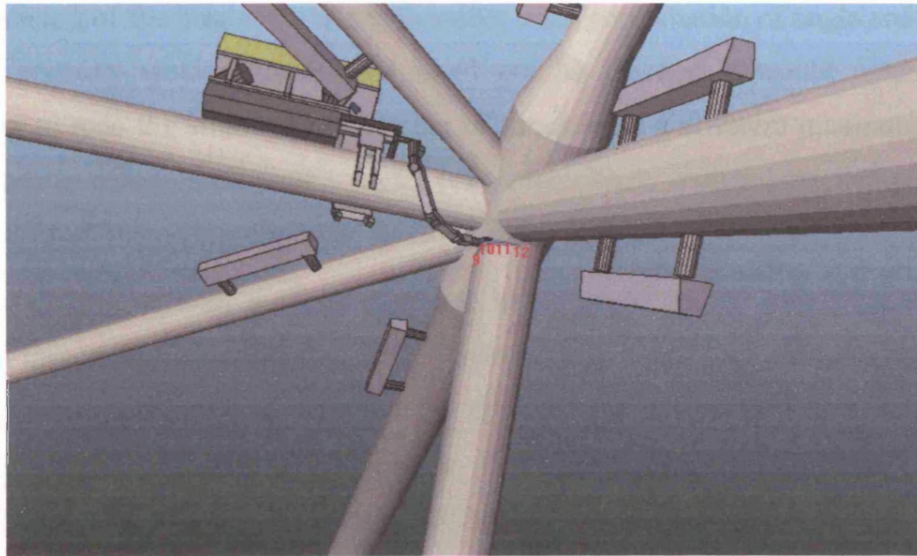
Covus ARM System inspecting 10 to 10.30 on Woodside weld 9
